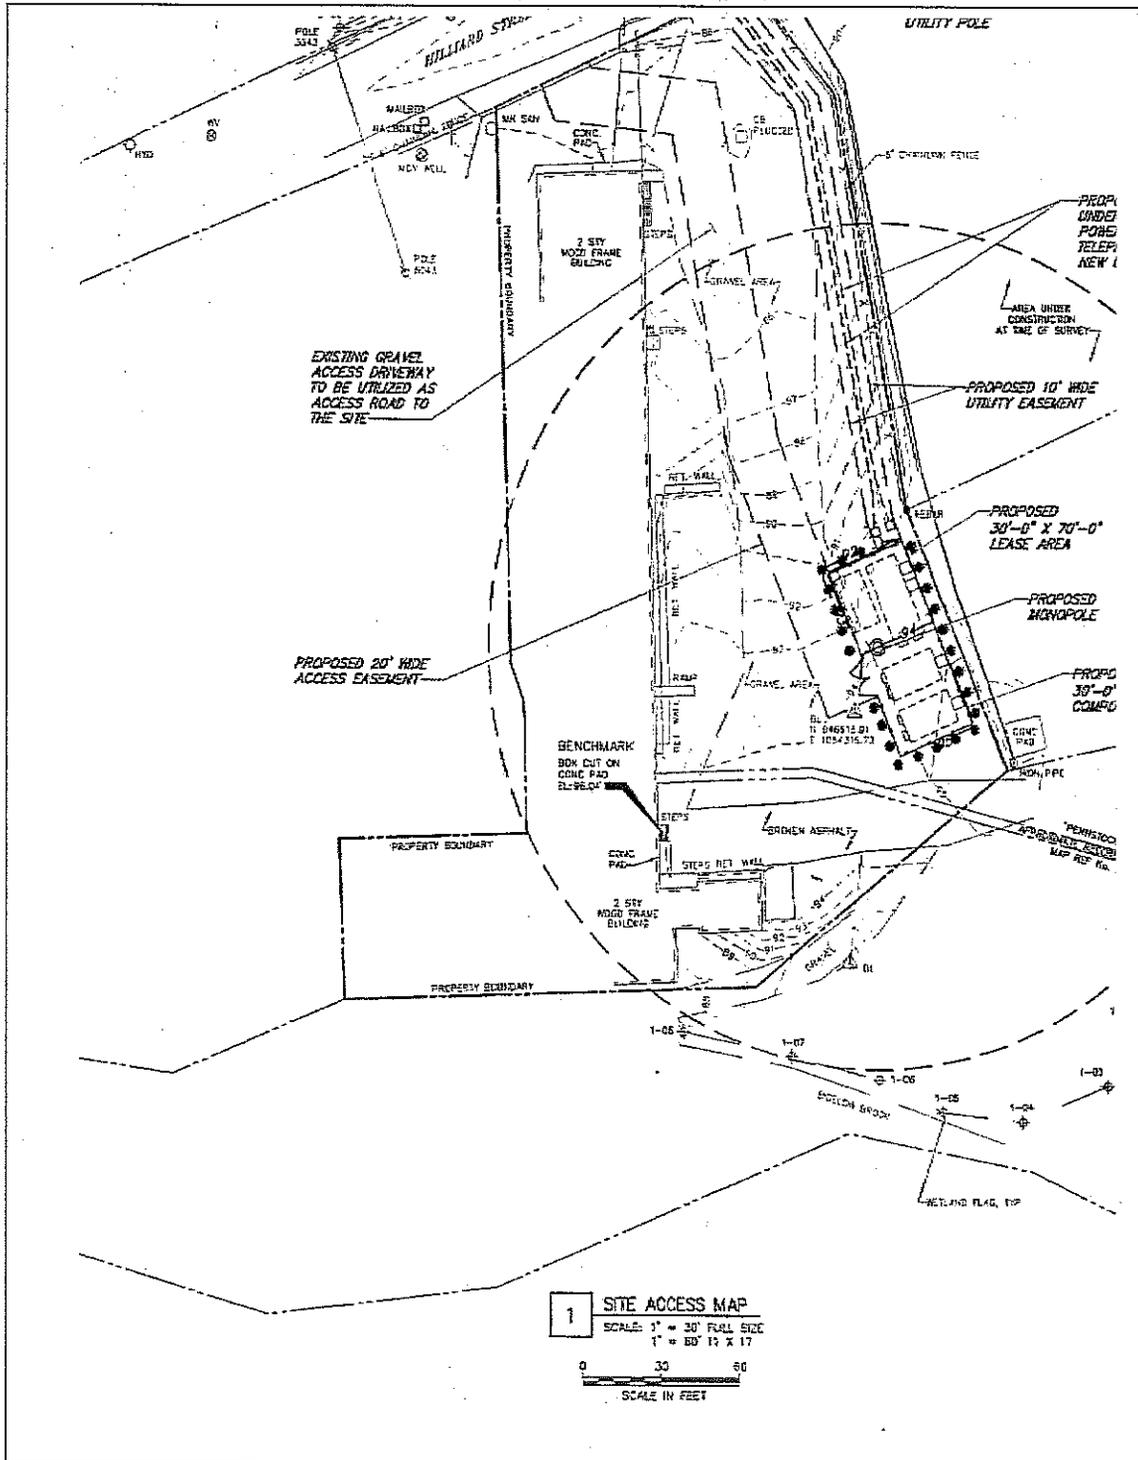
Location of the proposed compound and access road. (Applicants 1, Tab B)
